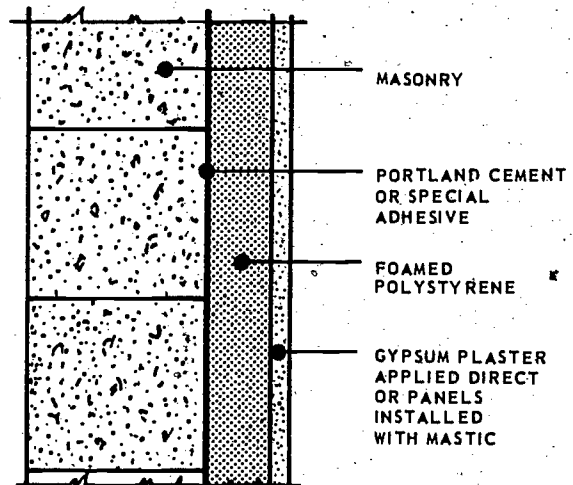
Insulating a masonry wall with rigid insulation board made from foamed polystyrene "Styrofoam."
